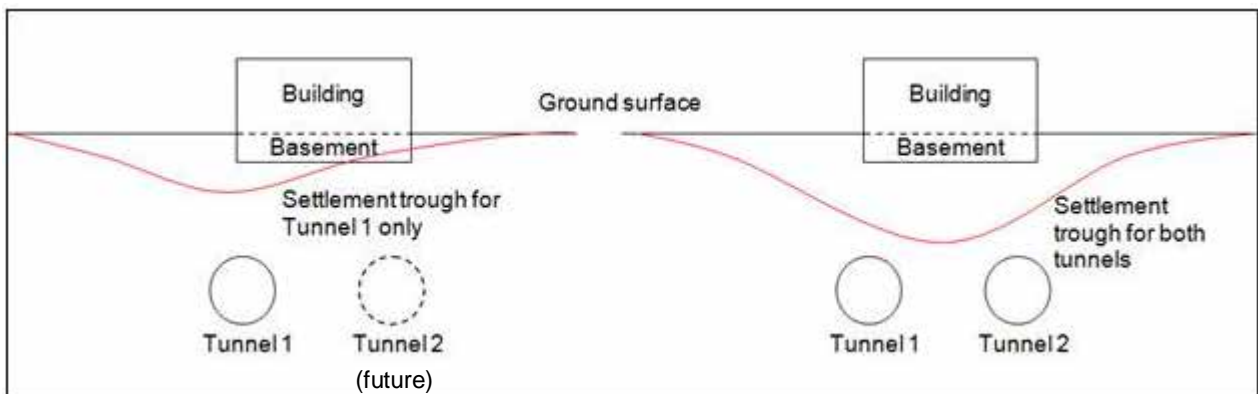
Exaggerated ground settlement troughs for single and twin tunnels
